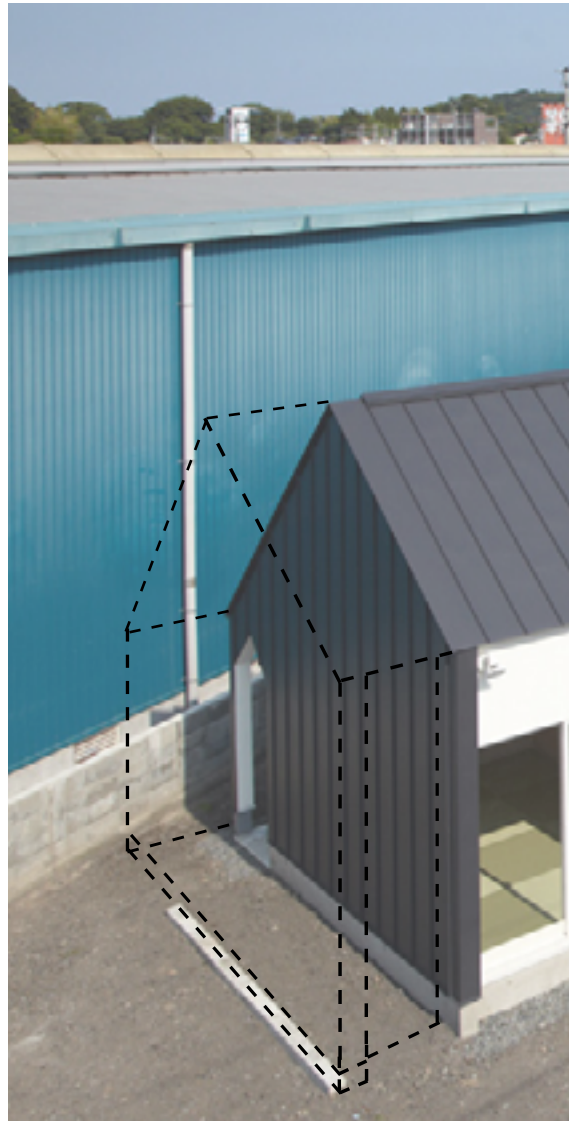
Extensions can be differentiated from one another with the gable wall extending to the eaves. When an addition is added, the extended wall creates a visible junction between old and new.
